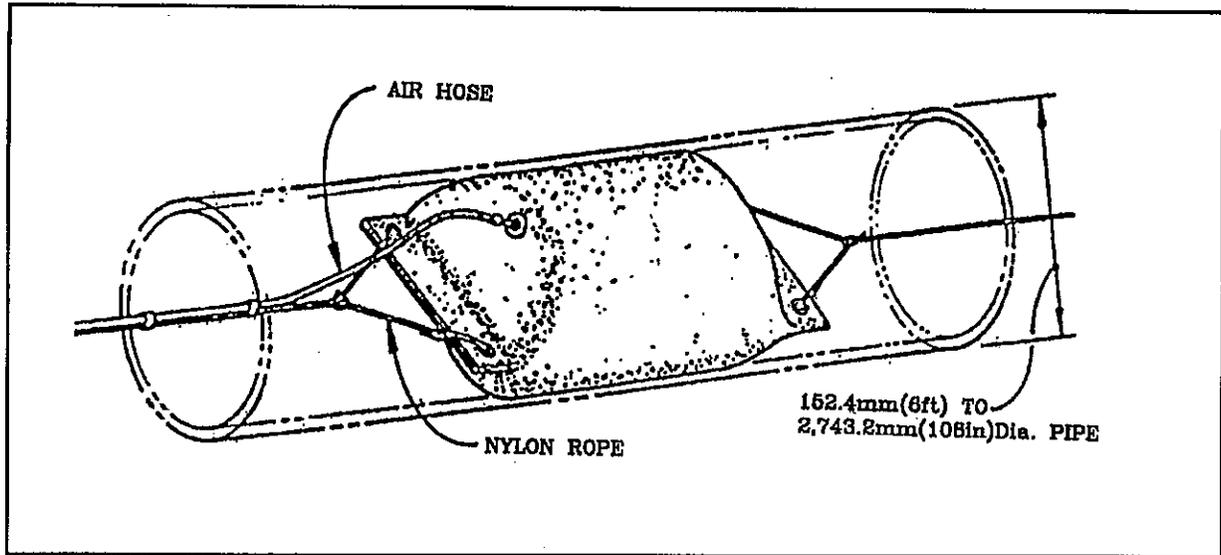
Prefabricated rubber pipe stoppers for outlet opening of a manhole
